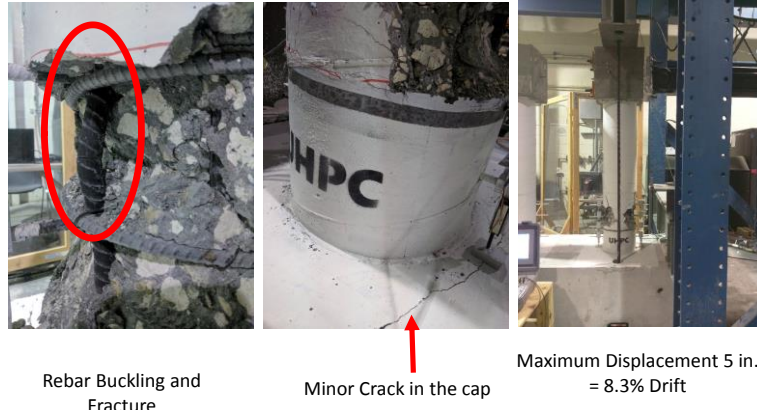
Failure pattern, longitudinal rebar fracture and location of the plastic hinge in the S-5-12.
